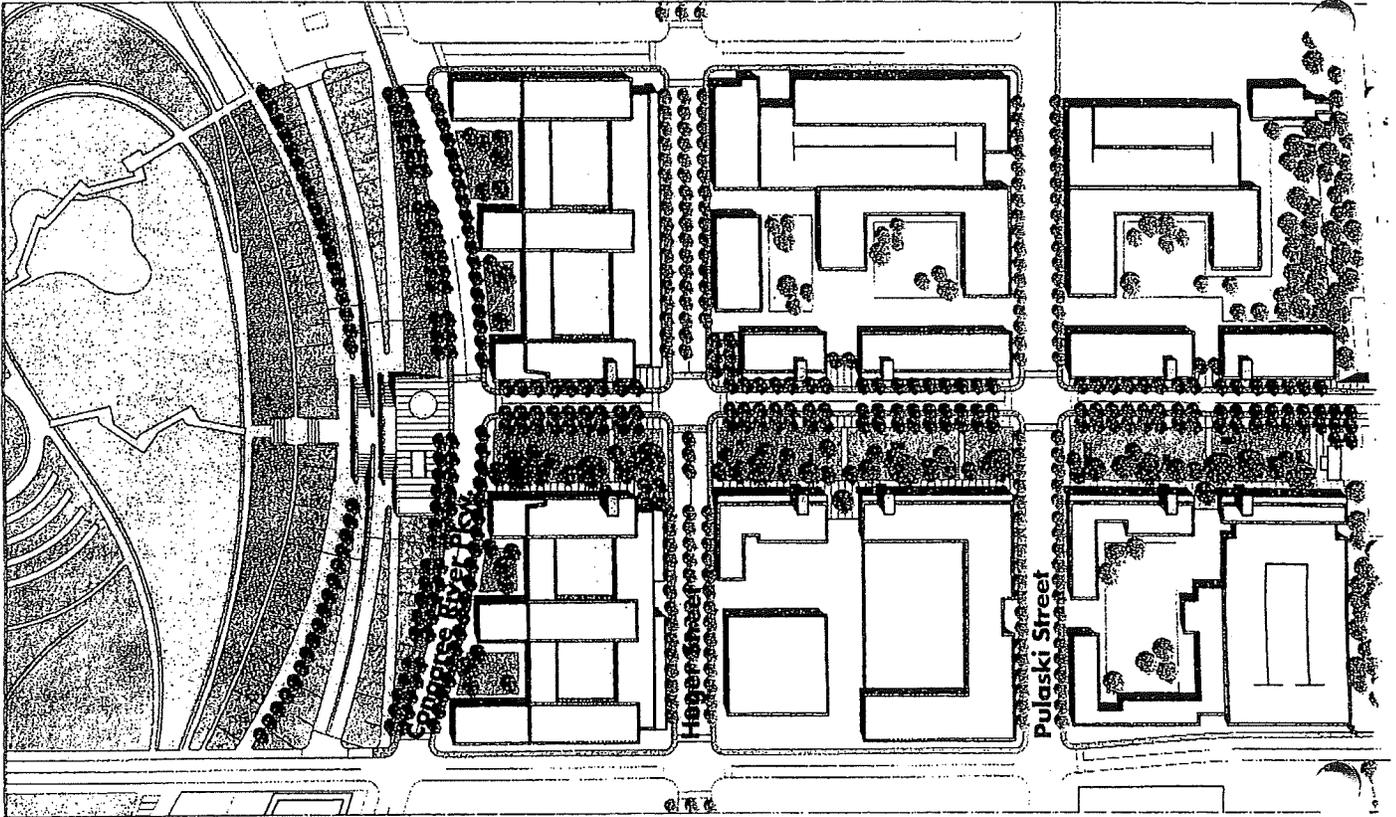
GREENE STREET CORRIDOR ILLUSTRATIVE PLAN, WITH FOUNDATION SQUARE HIGHLIGHTED IN RED
